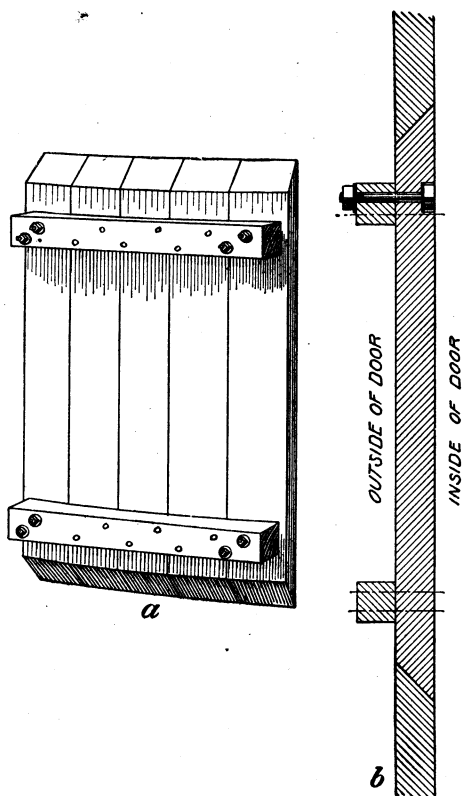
The finished door: *a*, Door showing outer face and cleats; *b*, section of side wall showing how door fits.
